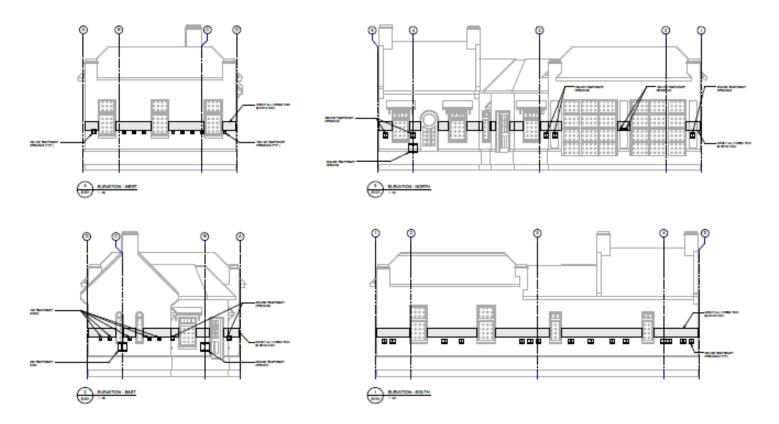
The elevations document the openings required to stabilize the block walls. The attached drawing S101 indicates the location of masonry openings. Source: Cleland Jardine Engineers. 2023.
